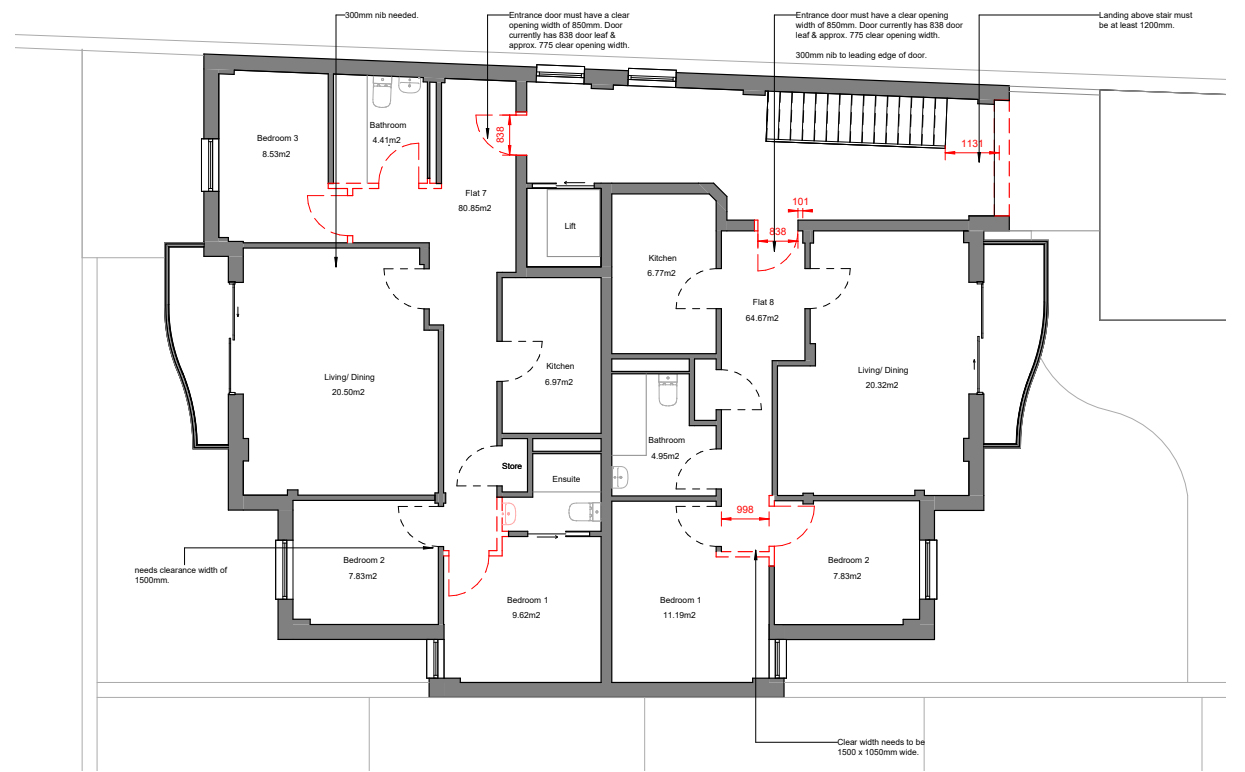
BLOCK 3 APPROVED SECOND FLOOR PLAN
